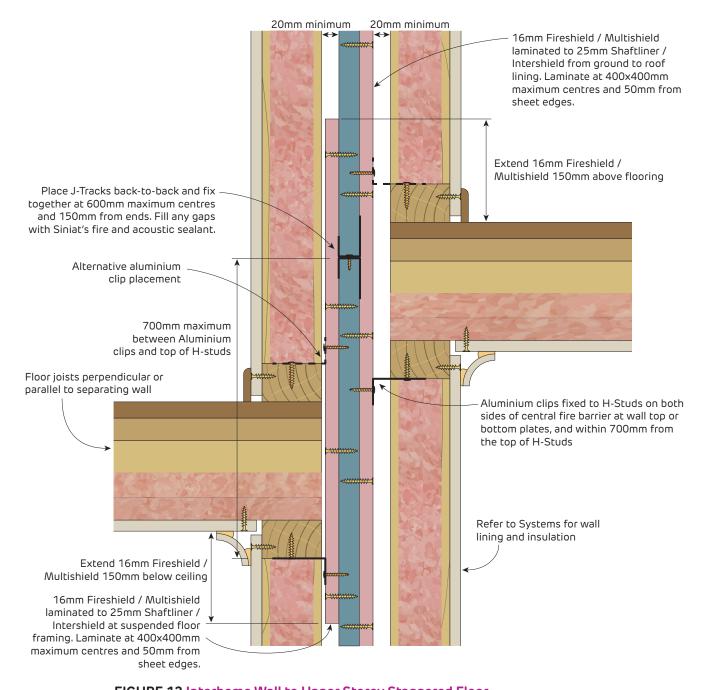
Interhome Wall to Upper Storey Staggered Floor
